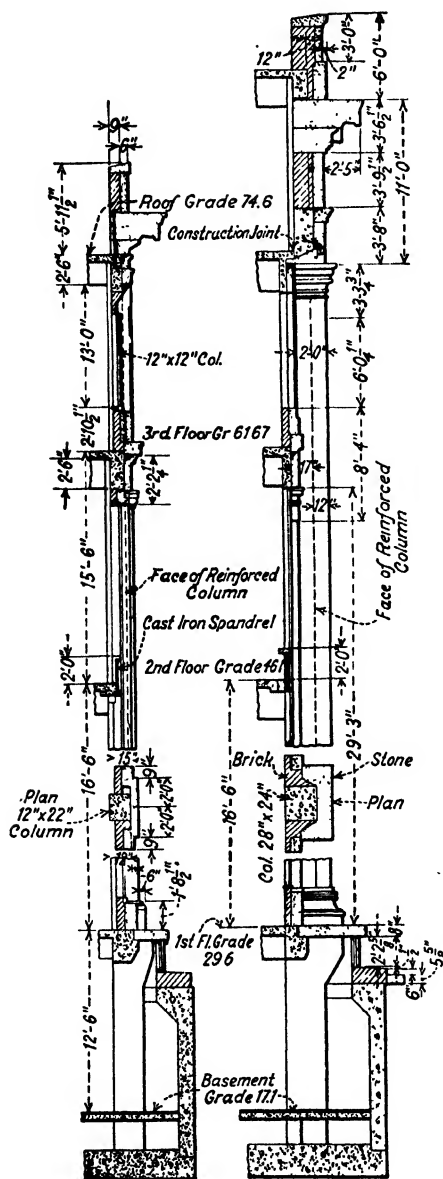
Ornamental Façades on Major and Minor Courts, Massachusetts Institute of Technology, Cambridge.
